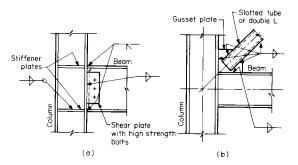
Welded connections. (a) Moment connection; (b) bracing connection.
